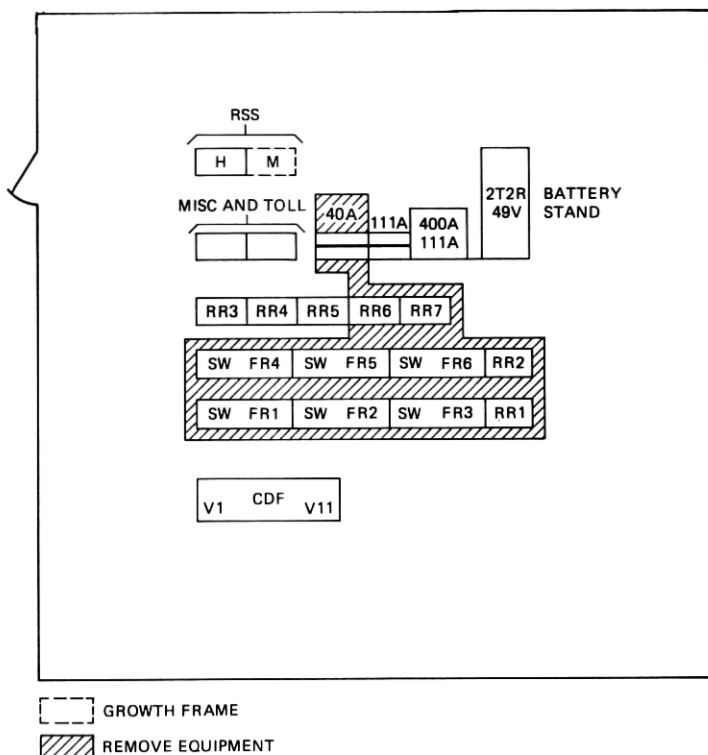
Typical RSS floor plan as a CDO replacement (800 lines step-by-step office).
